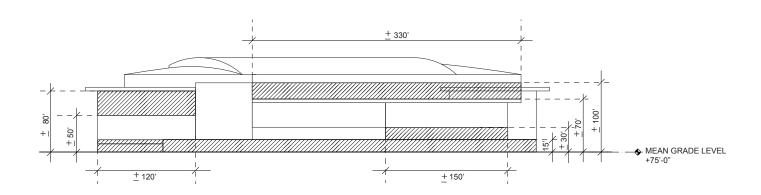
BUILDING HEIGHTS - RETAIL SITE B
